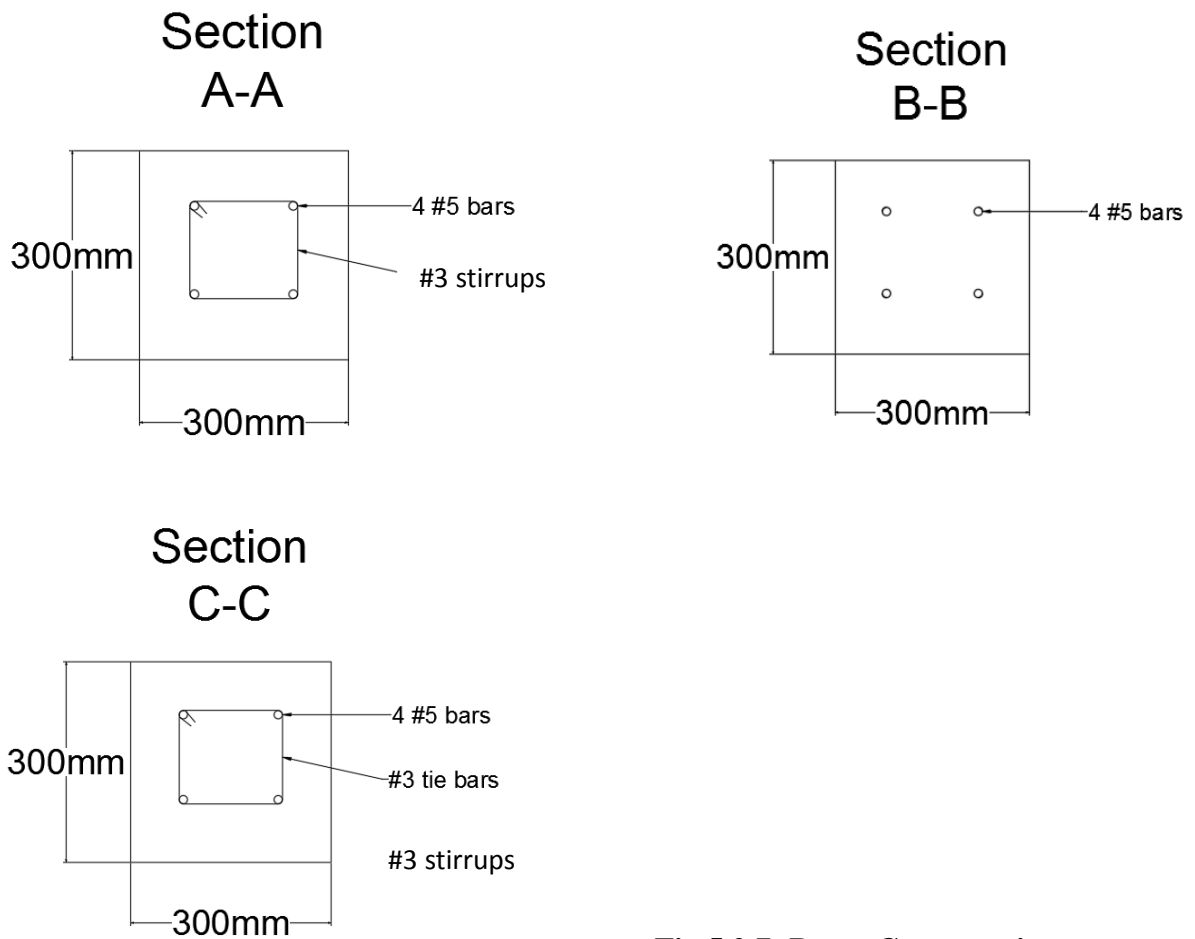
Beam Cross-sections for Y-axis 3F
